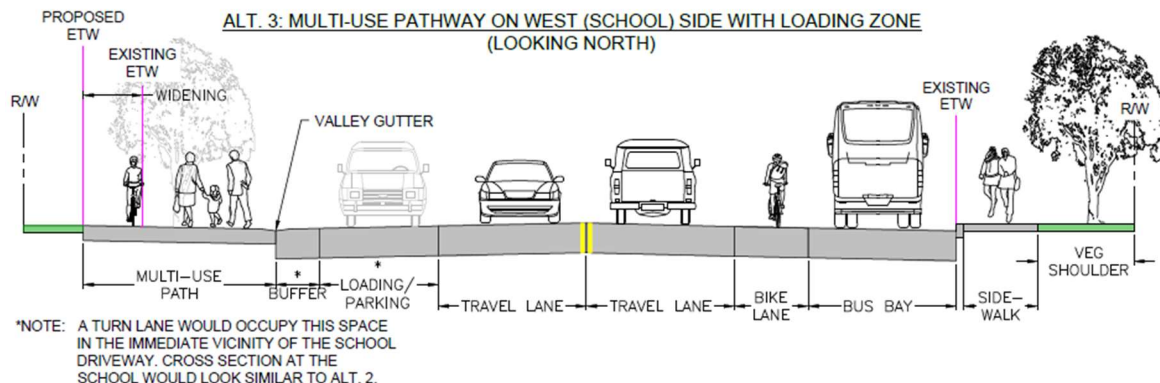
Ringwood Avenue Alternative 3 Near MAHS
